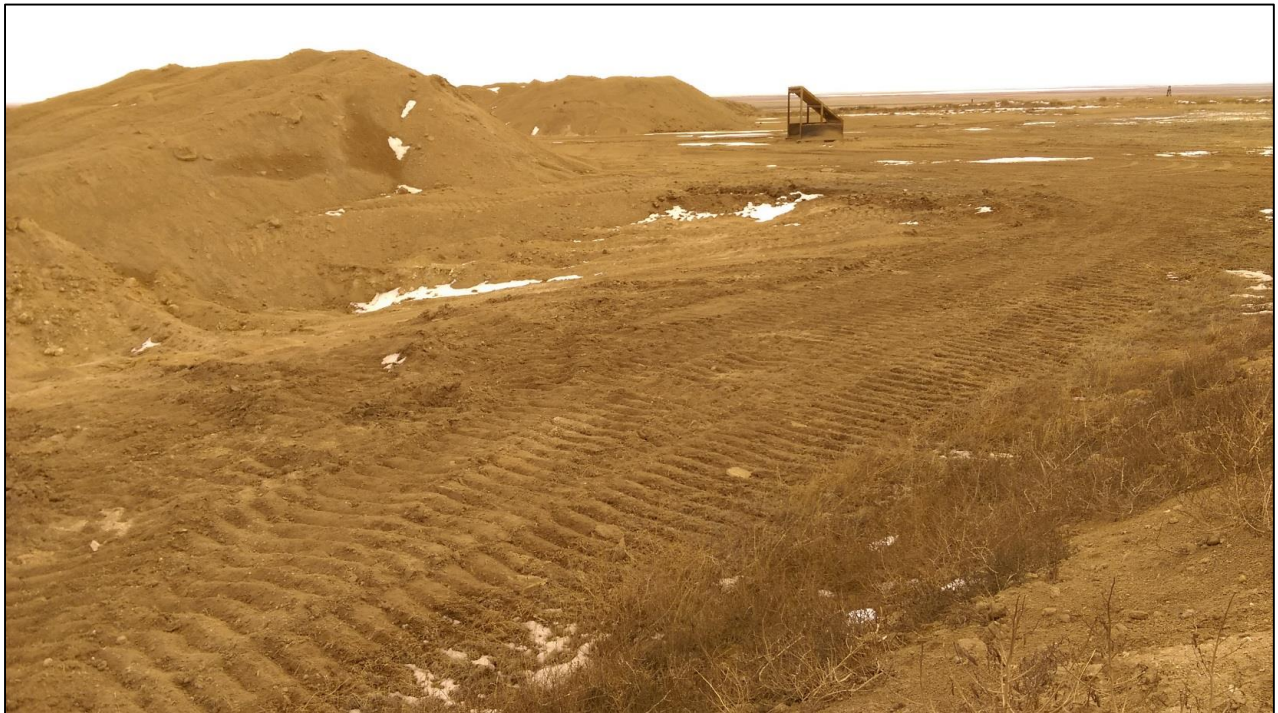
View looking southeast, showing a few material stockpiles stored south and southeast of the pit (at left).
